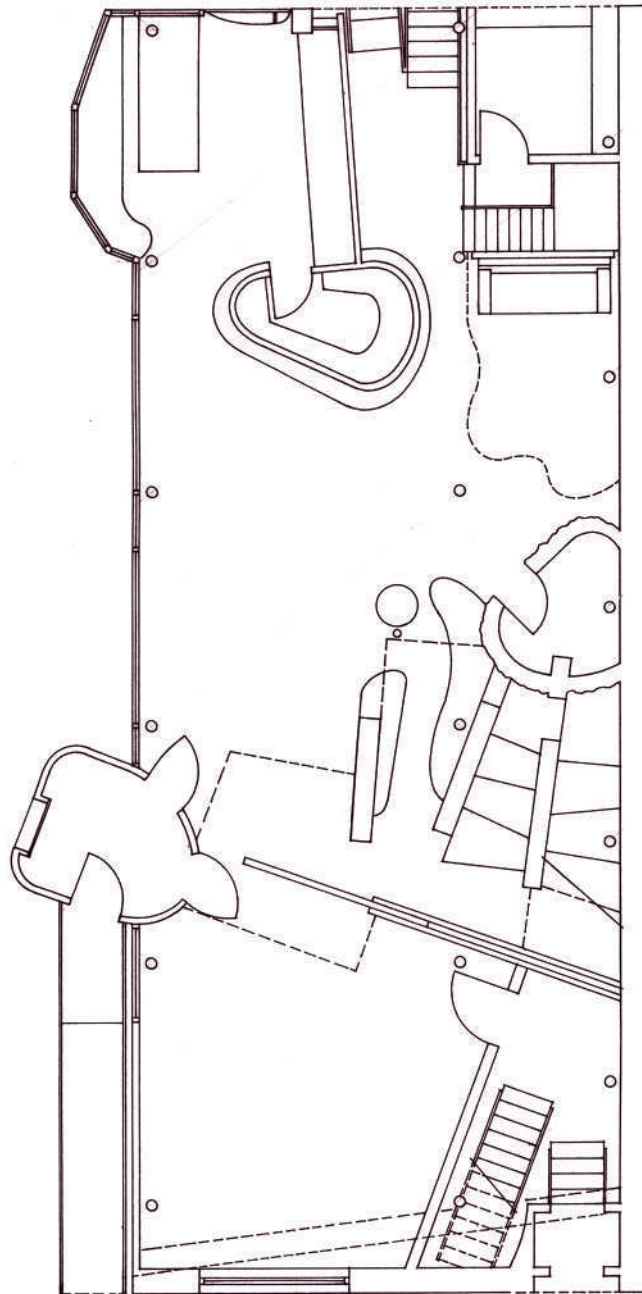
The Lay of the Plan. The trace transformed into a plan. Clutter filling the plan(e).
